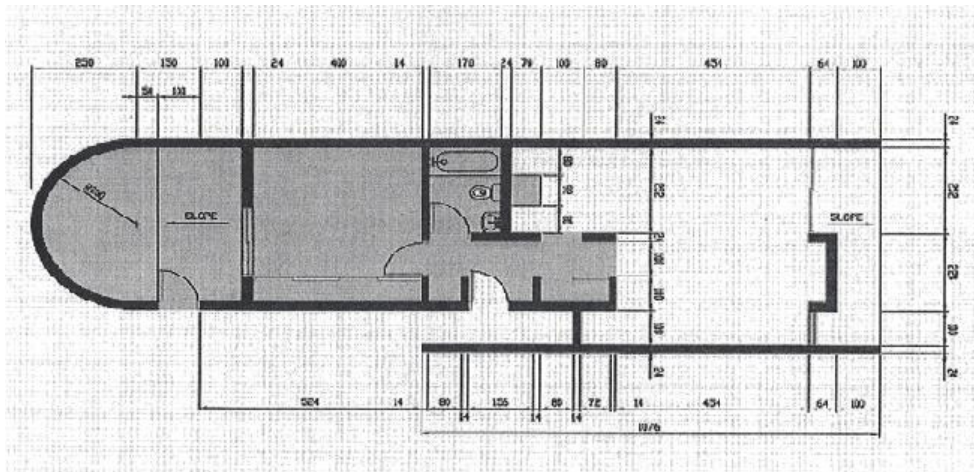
Floor plan of the guesthouse at KFUPM, Dhahran, Saudi Arabia.
